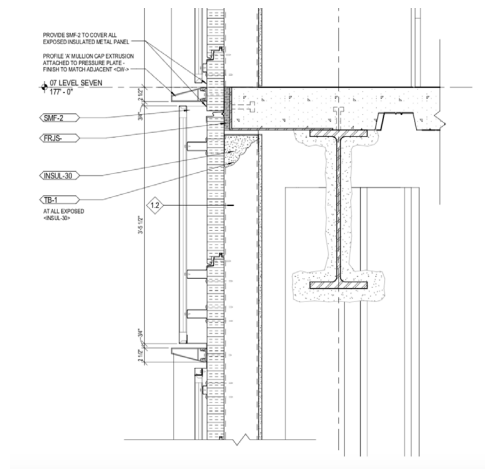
Exterior Metal Panel Wall Sections (provided by HGA)
